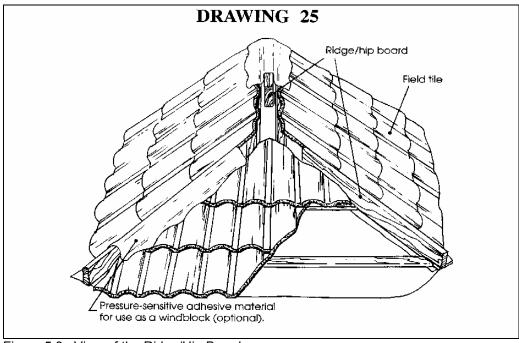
View of the Ridge/Hip Board (Courtesy of the FRSA roof tile installation manual [18])
